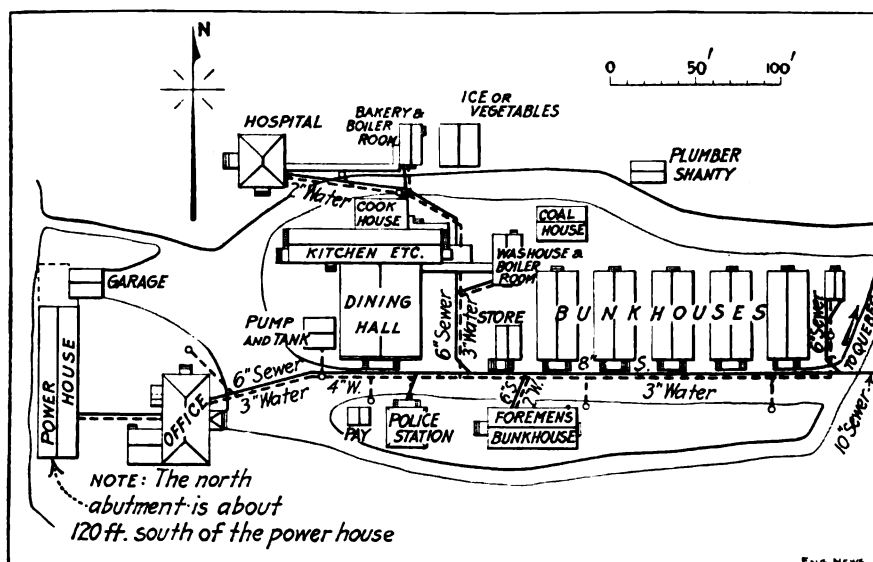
LAYOUT OF CAMP OF THE ST. LAWRENCE BRIDGE CO., LTD., AT QUEBEC BRIDGE
